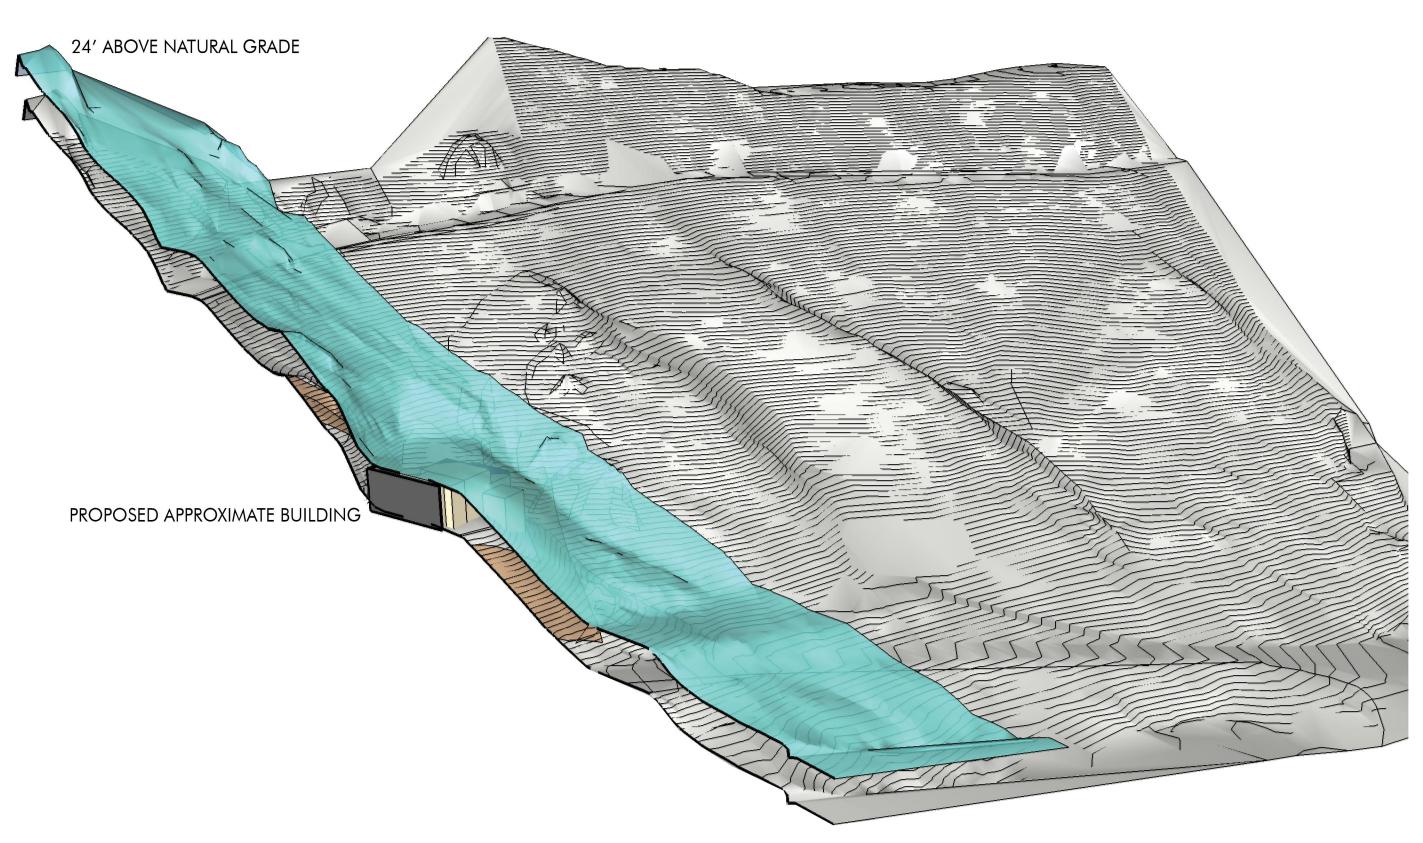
EXHIBIT G - PROPOSED 3D SECTION WITH 24' HEIGHT LIMIT
